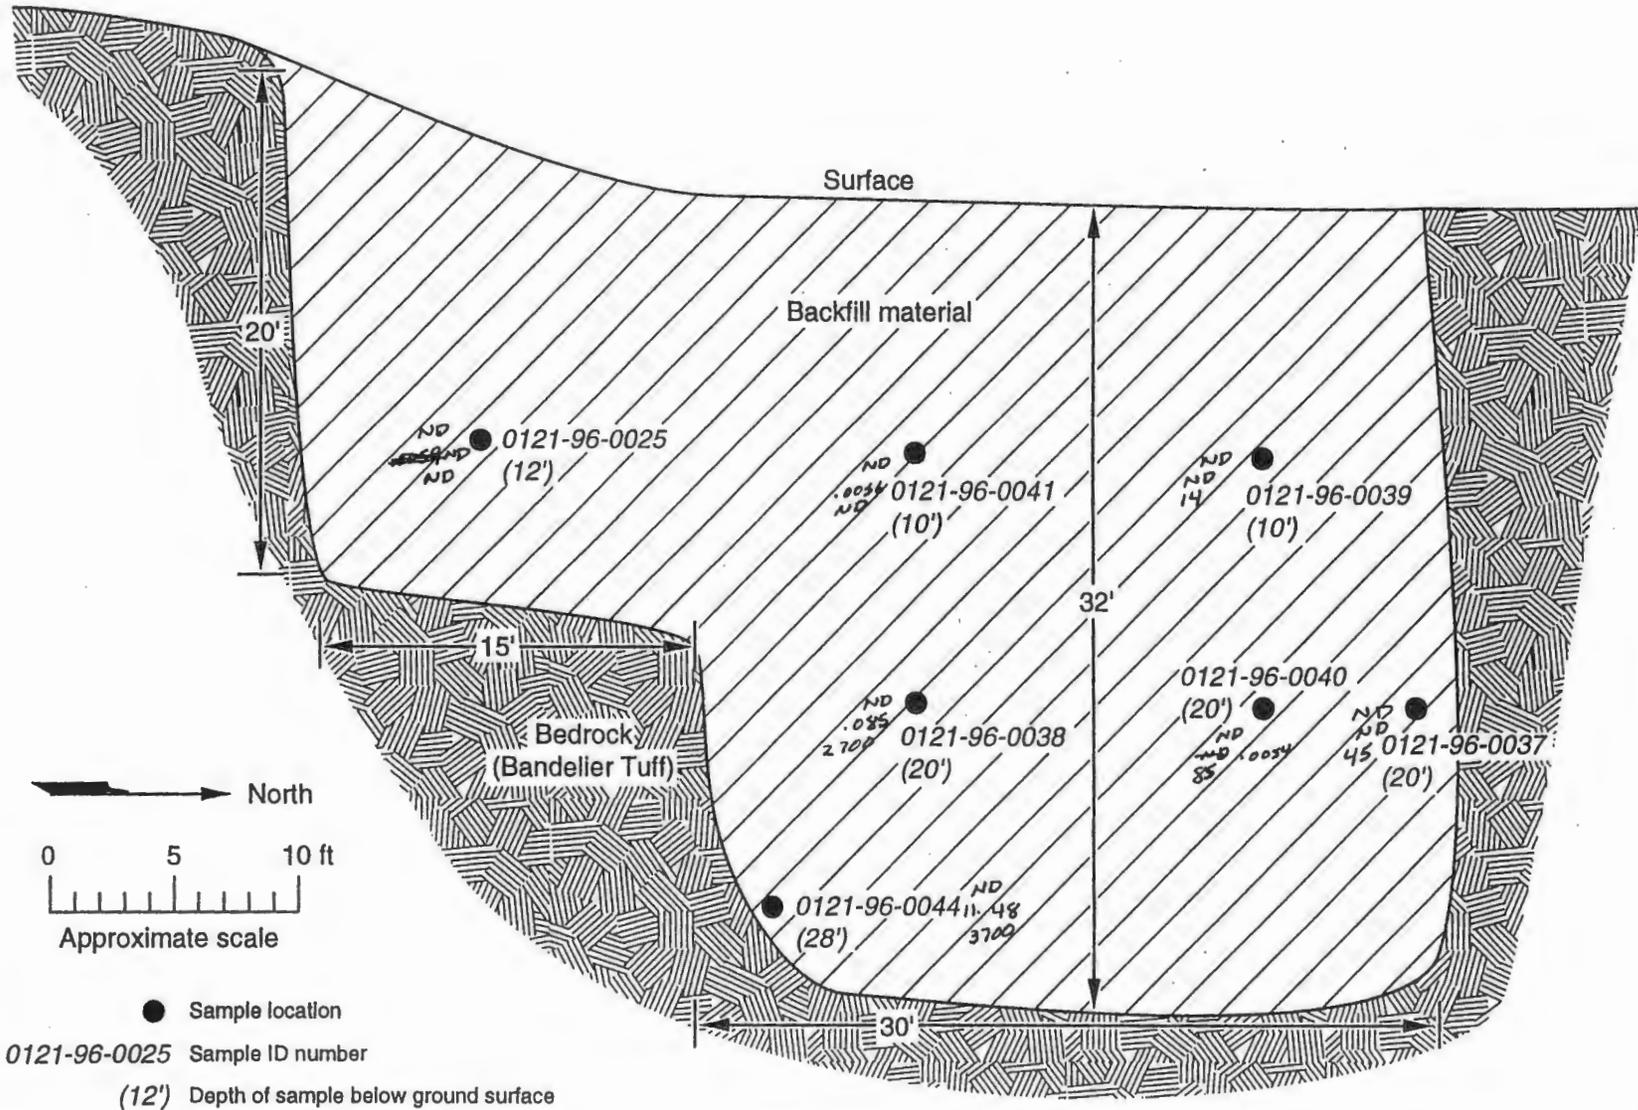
Approximate locations of confirmatory samples collected from west sidewall of excavation.
